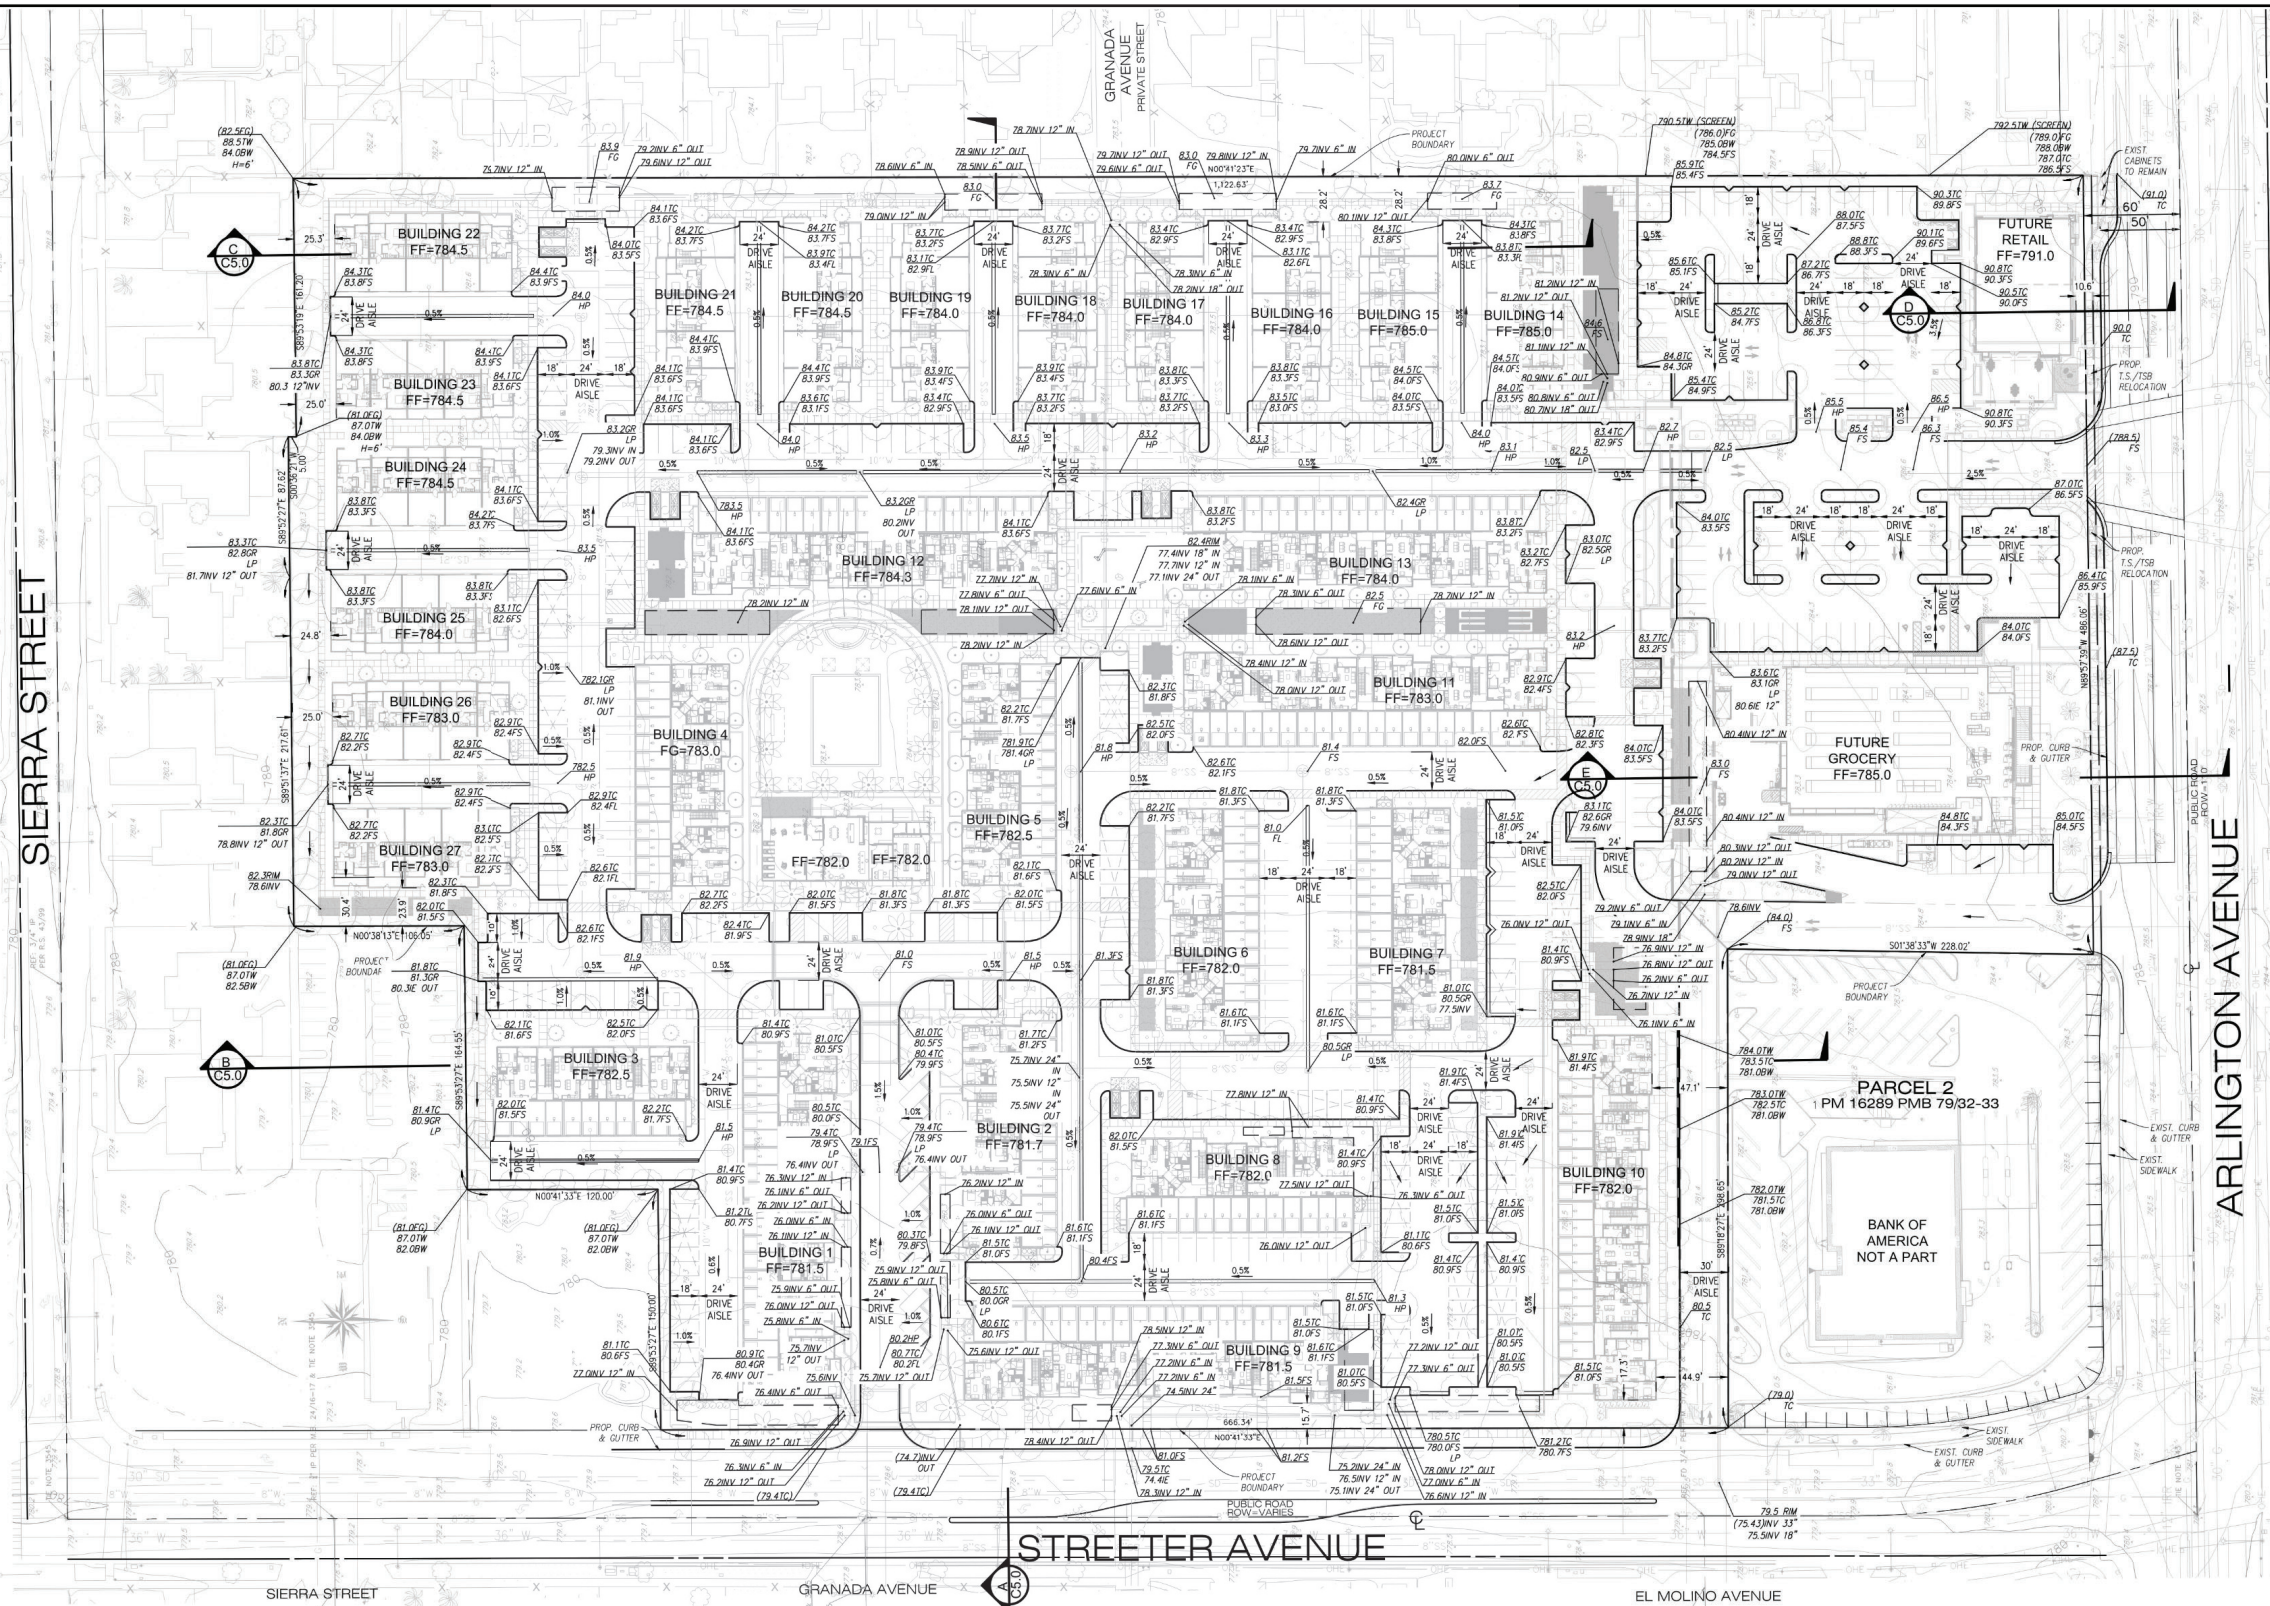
Existing and Proposed Utility Plan Arlington Mixed Use
